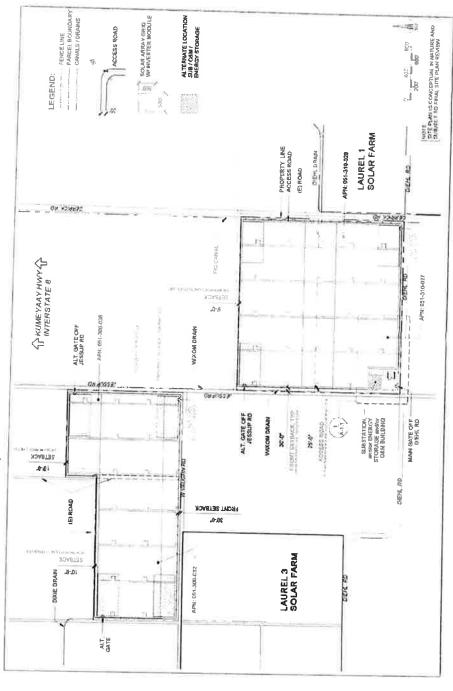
Laurel 2 Solar Farm – Site Layout
